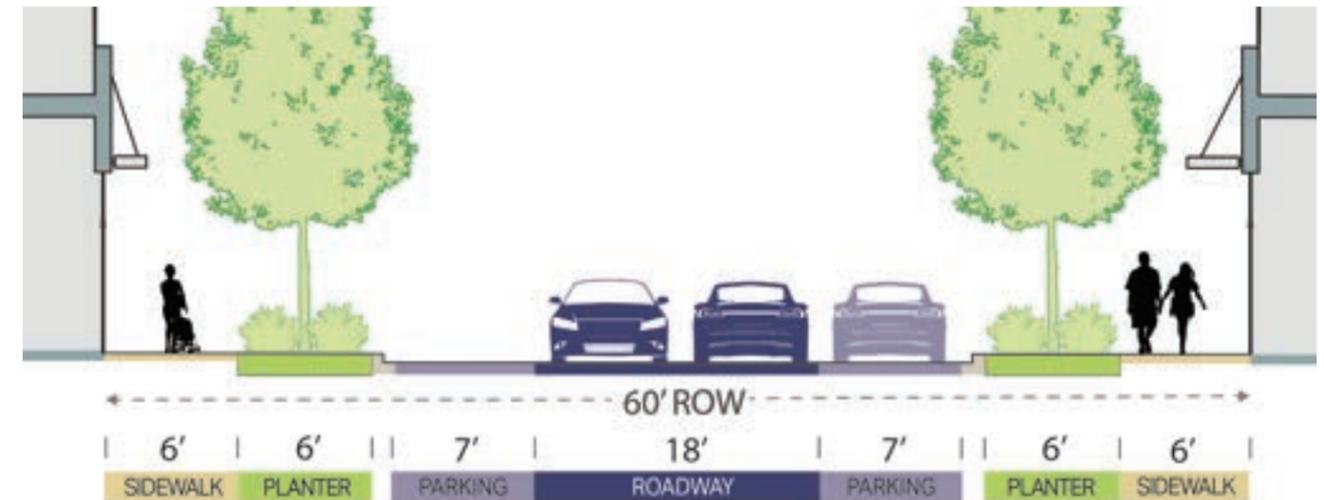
Imagery depicting typical cross sections of connecting major streets
